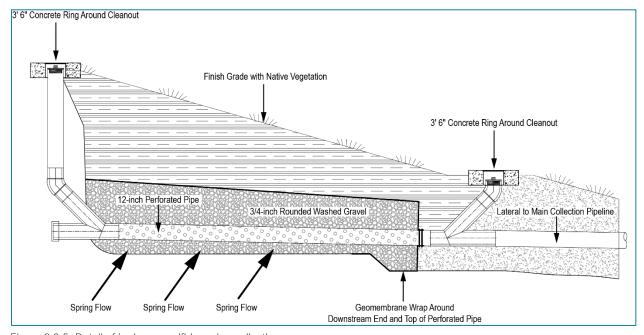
Detail of hydrogen sulfide spring collection.
